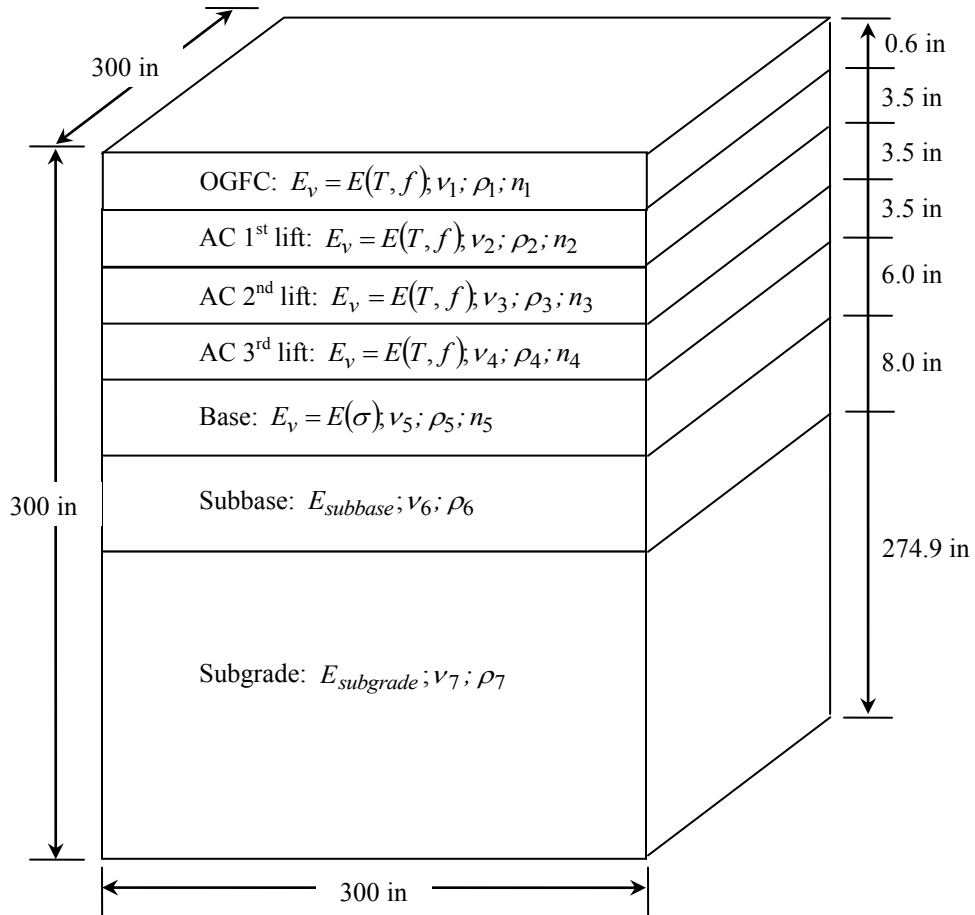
Multilayered structure of pavement section at MP 141, I-40
